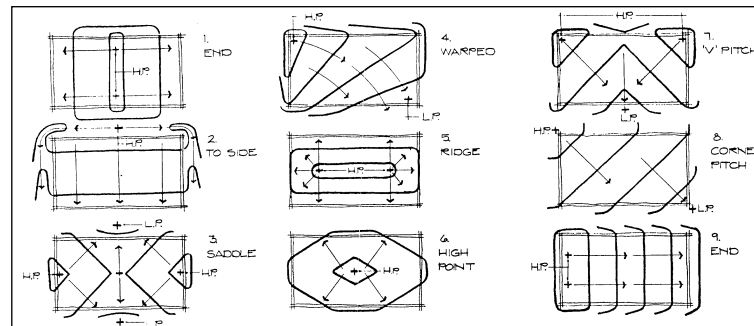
Drainage Pattern Construction. Landphair, 1988
